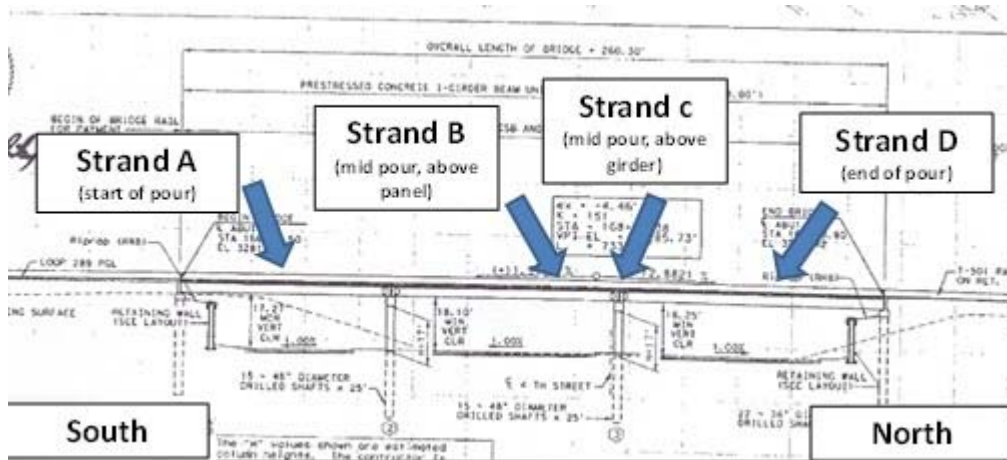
iButton strand layout for Lubbock bridge deck.
